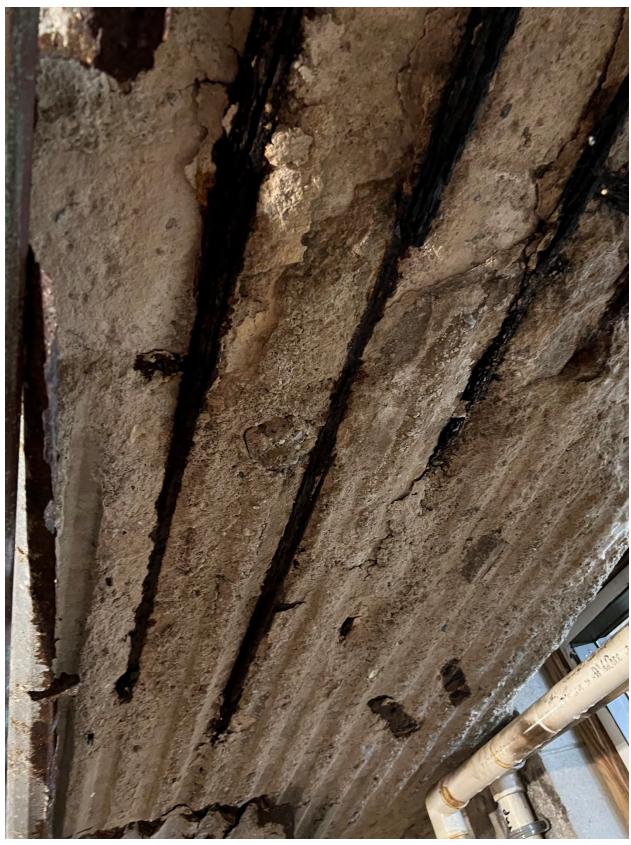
Close-up view of corroded reinforcing showing signs of significant loss of section
